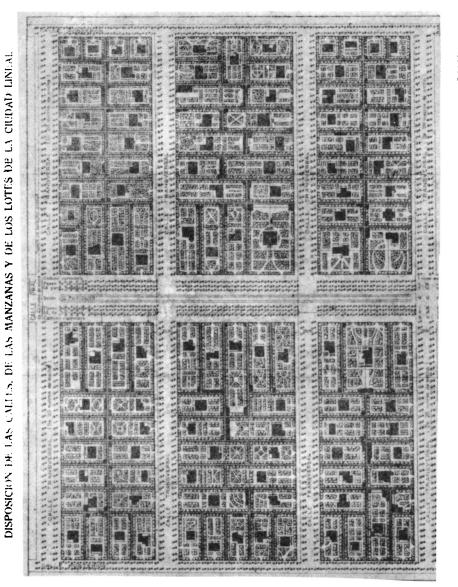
Plan showing proposed method of subdivision of land and site planning (1911). Source, C.M.U.
